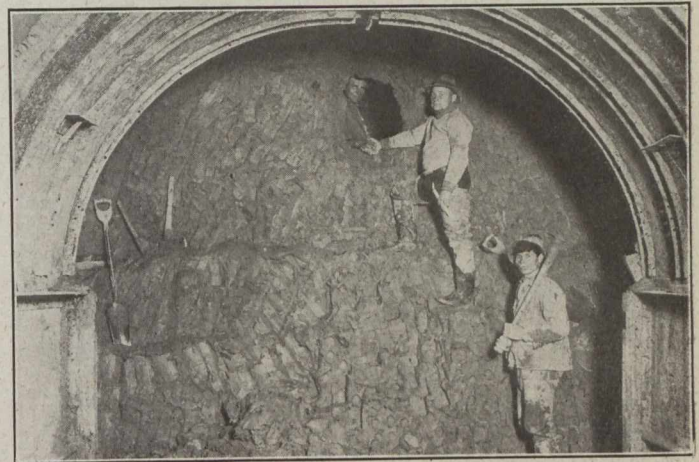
Meeting of Two Headings, Main Garrison Creek Storm Overflow Sewer, Section No. 1.
